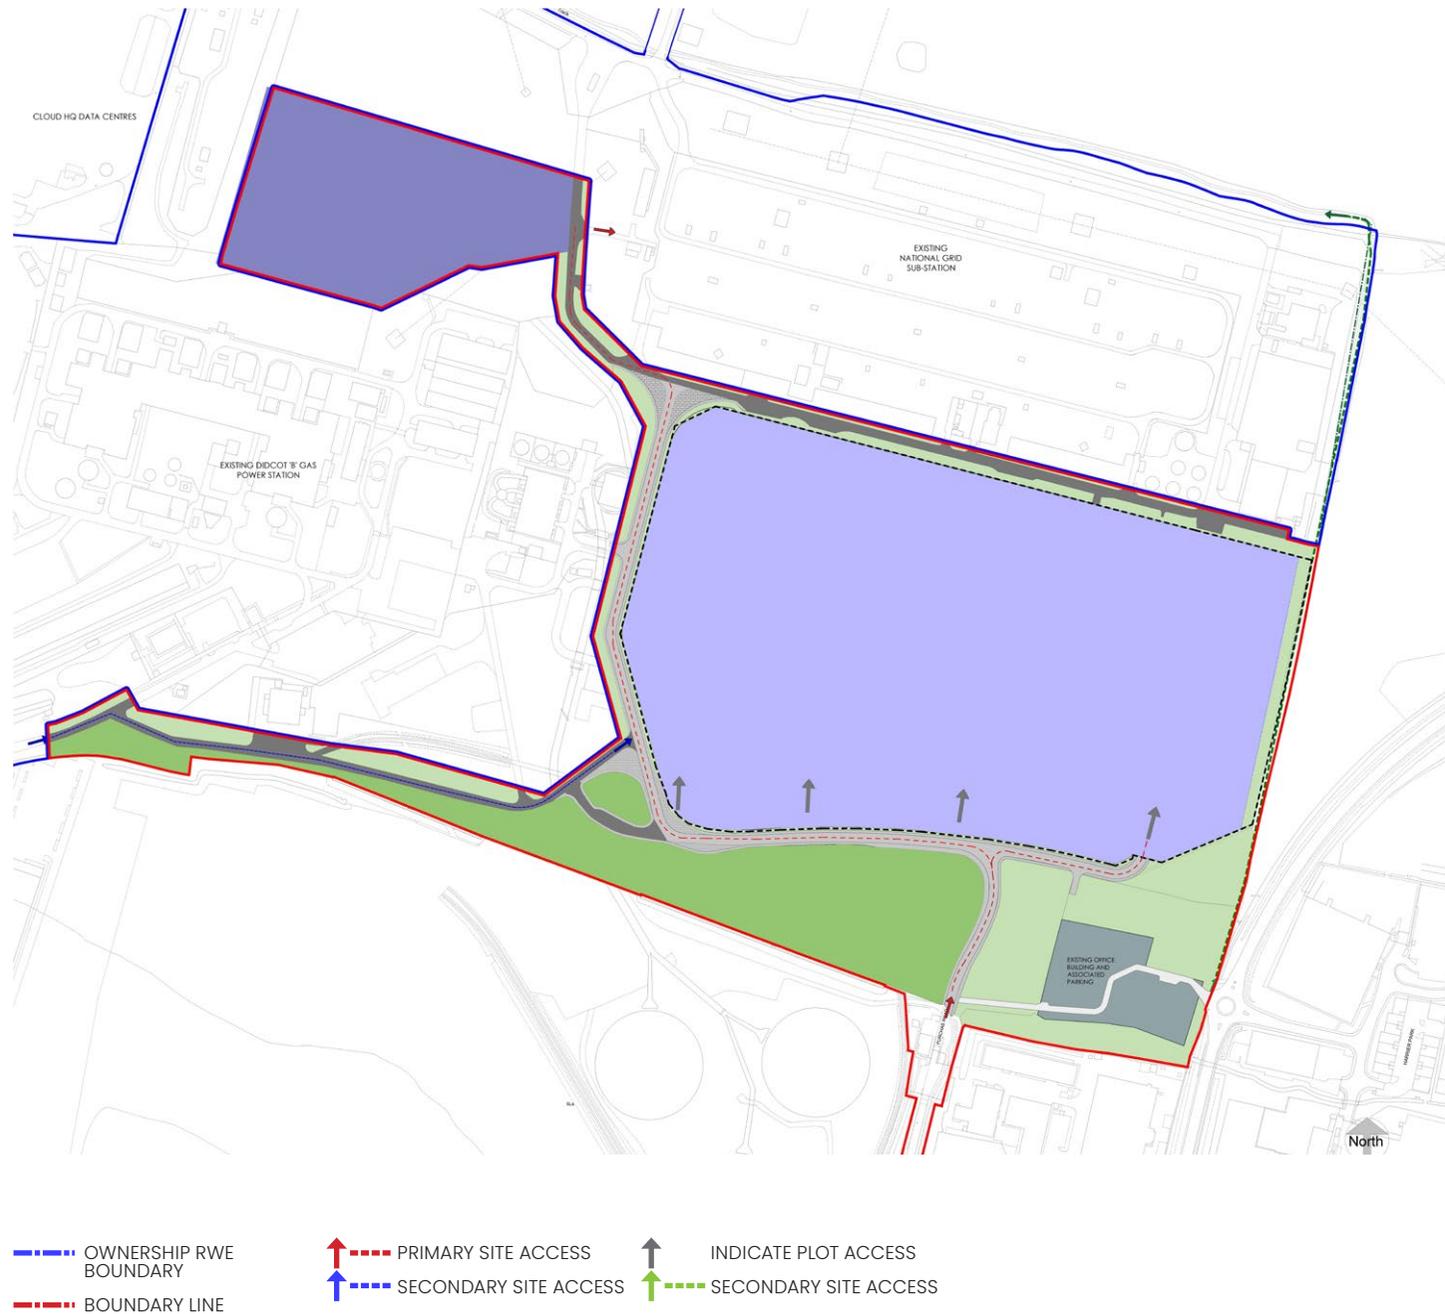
PARAMETER PLAN (MOVEMENT AND ACCESS)
